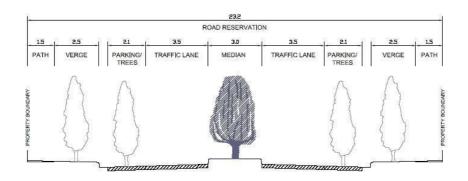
(d) Port Sorell and Environs Street Cross-section designs -Park Edge Street
